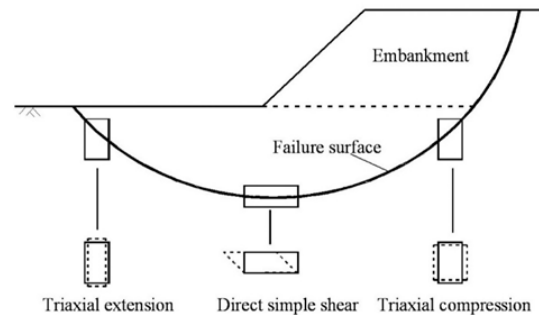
Subsoil failure mechanisms in different zones of potential failure surface under embankment (Zdravkovic, Potts & Hight 2002).
